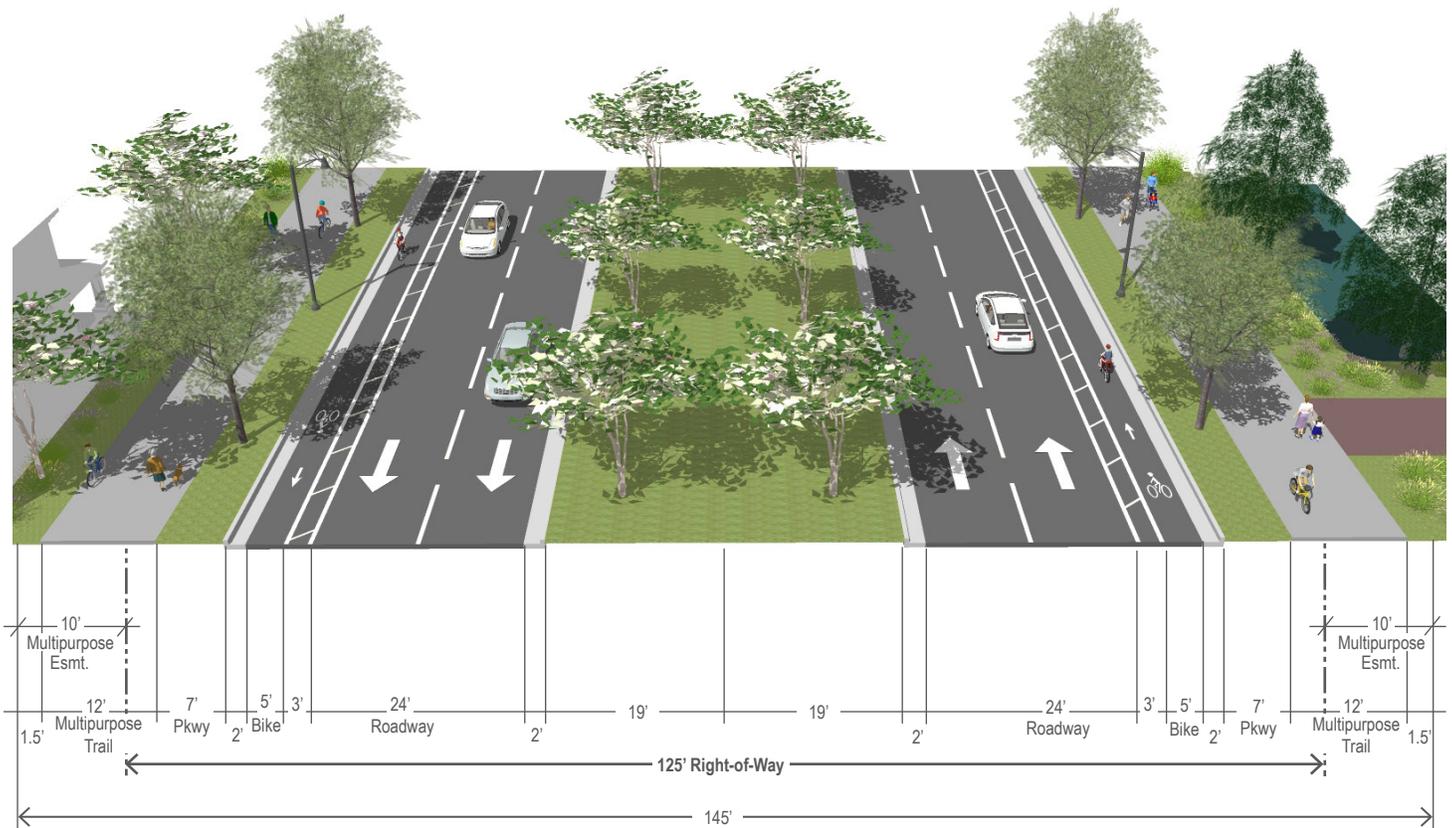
(b): First and Second Order Street Typical Section in T3
